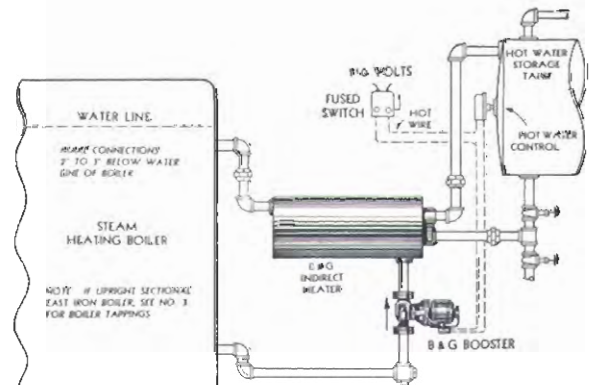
Where Heater and tank must be kept low, install a B & G Booster as indicated.
